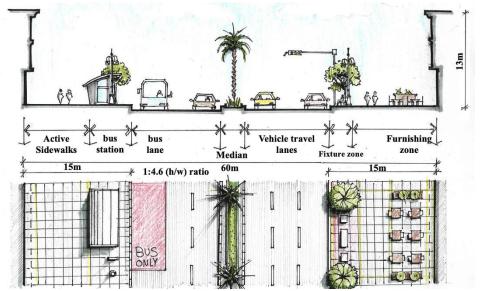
Cross-section through Tahlia Street (Source: Authors)
